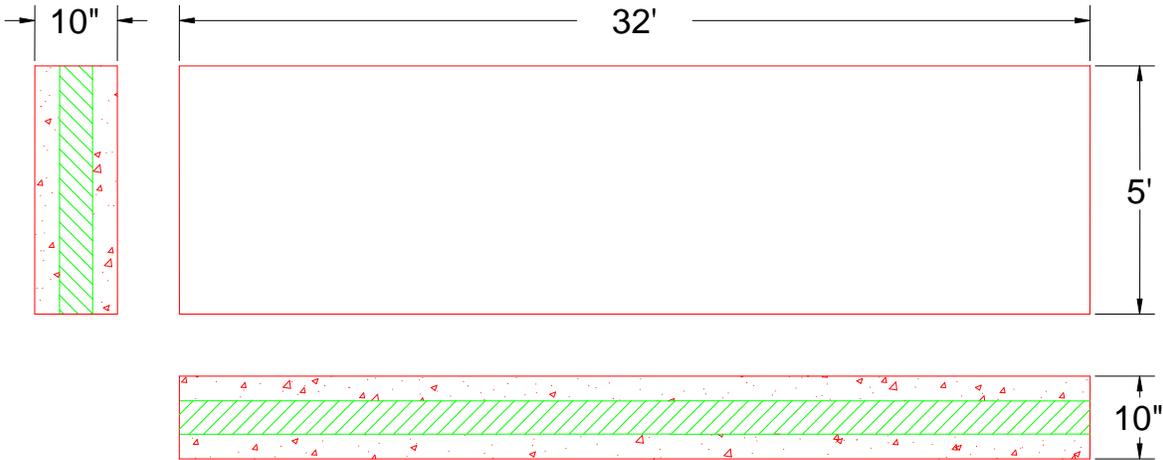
Precast sandwich wall panel for NU-Tie design (Not-to-scale)
